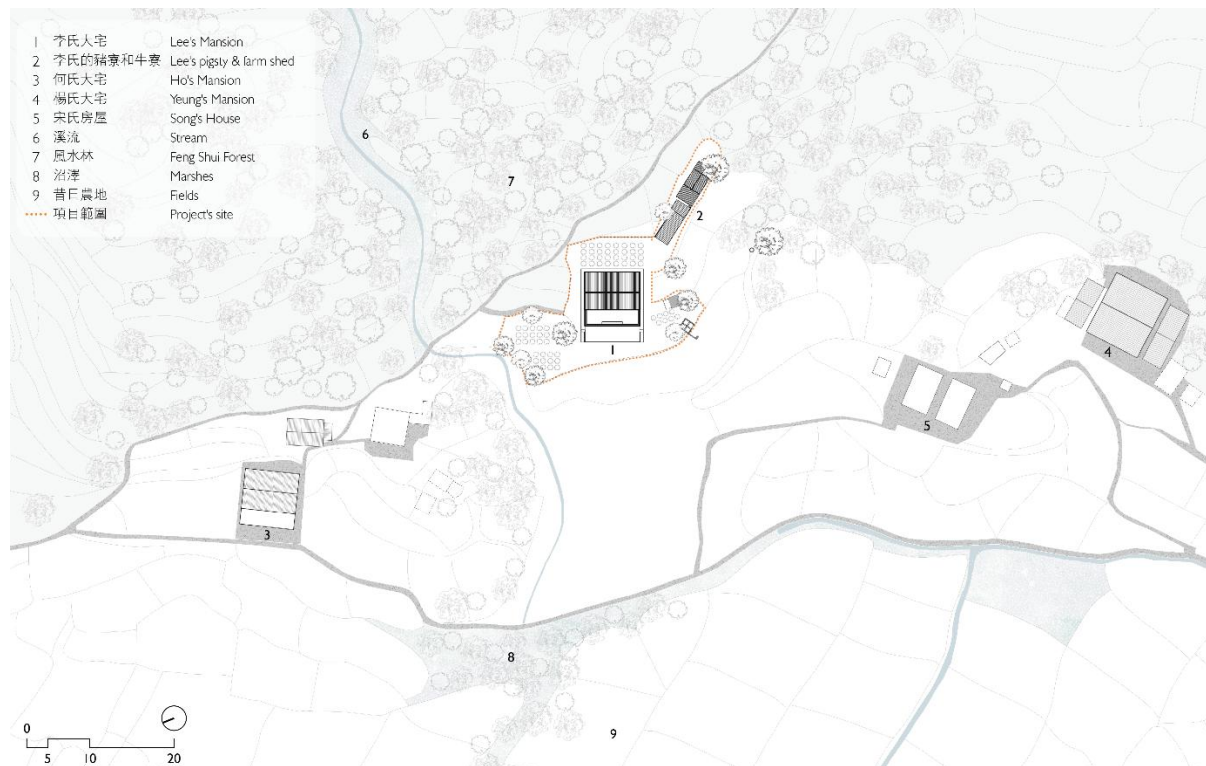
Site Plan showing the Lee's residential compound and its surrounding
